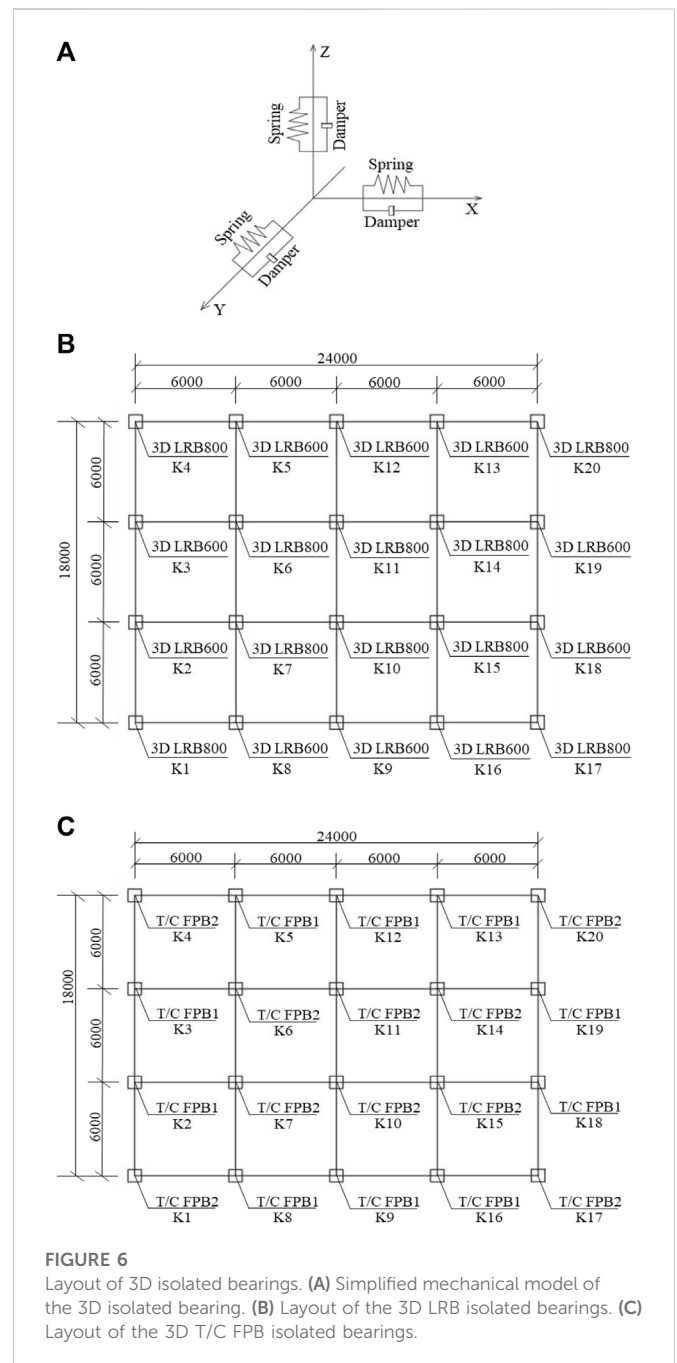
Layout of 3D isolated bearings. (A) Simplified mechanical model of the 3D isolated bearing. (B) Layout of the 3D LRB isolated bearings. (C) Layout of the 3D T/C FPB isolated bearings.
